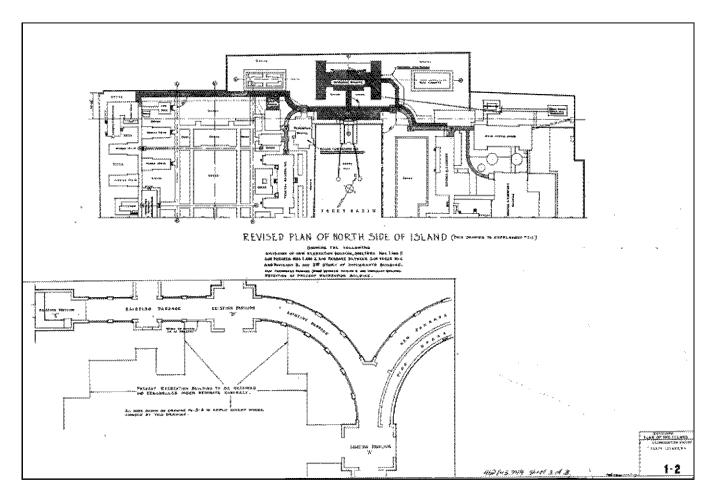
"Revised Plan of North Side of Island" showing linen exchange addition, (24 March 1934) (NPS Drawing No. 462/43,944, Sheet 3of 3)
